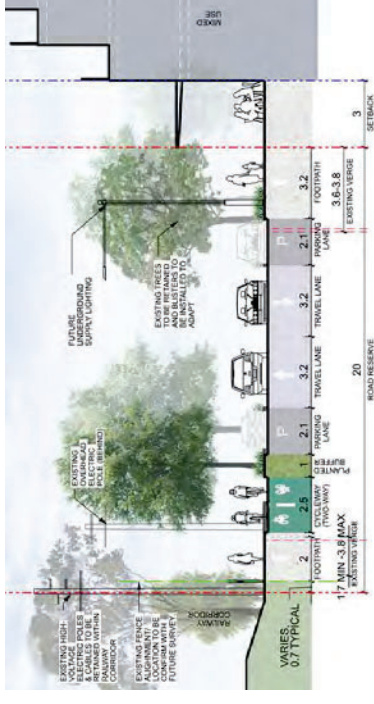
Blaxland Road South (Between Llewellyn Street and Train Station) - Section
